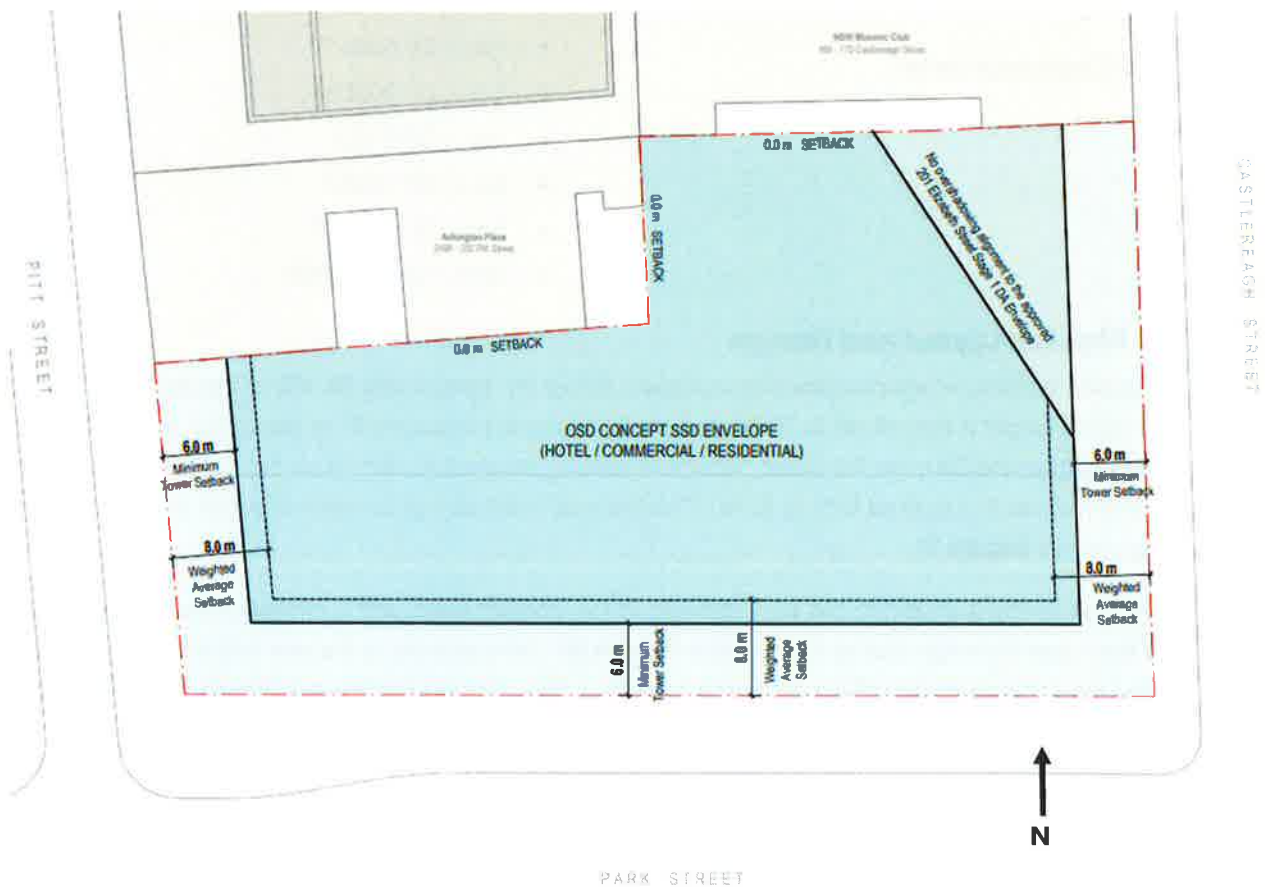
| Building envelope plan showing setbacks (source: EIS)
